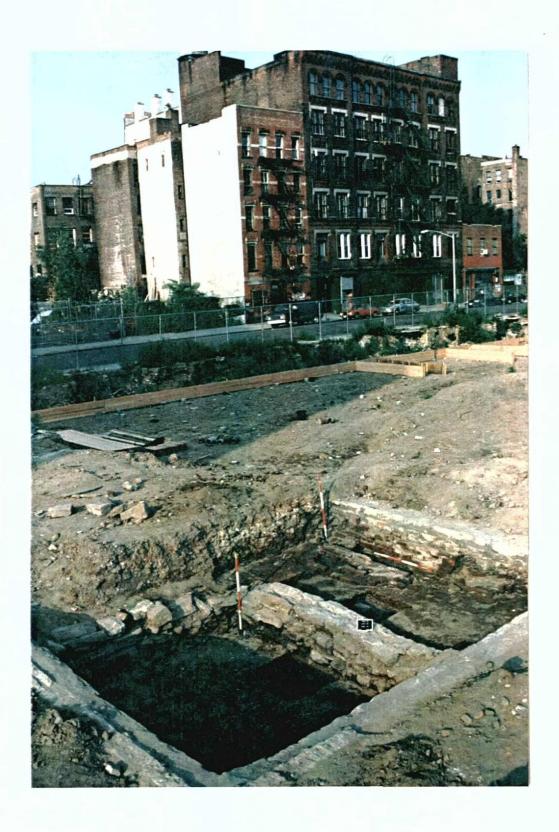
General view looking northeast towards 9th Street showing historic stonewall in Lot 17 beneath more modern cement lot line parting walls.
